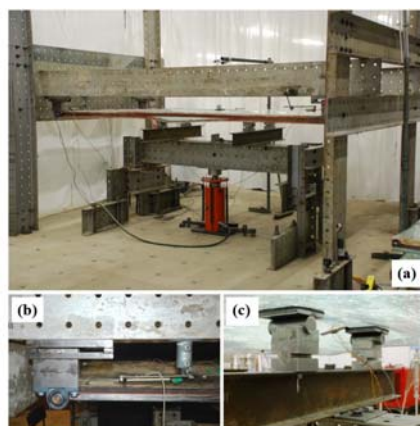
Bending test rig with a full-scale specimen (a) full view; (b) connection of specimen to frame and (c) rubber-padded steel loading plates.
